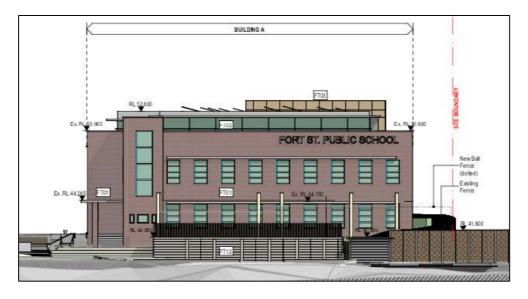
Setback of new storey addition from northern façade- eastern elevation, allowing readability of original form of 1940s building. View from east (Source: FJMT DA-3001, SSDA01, 18.12.19)
